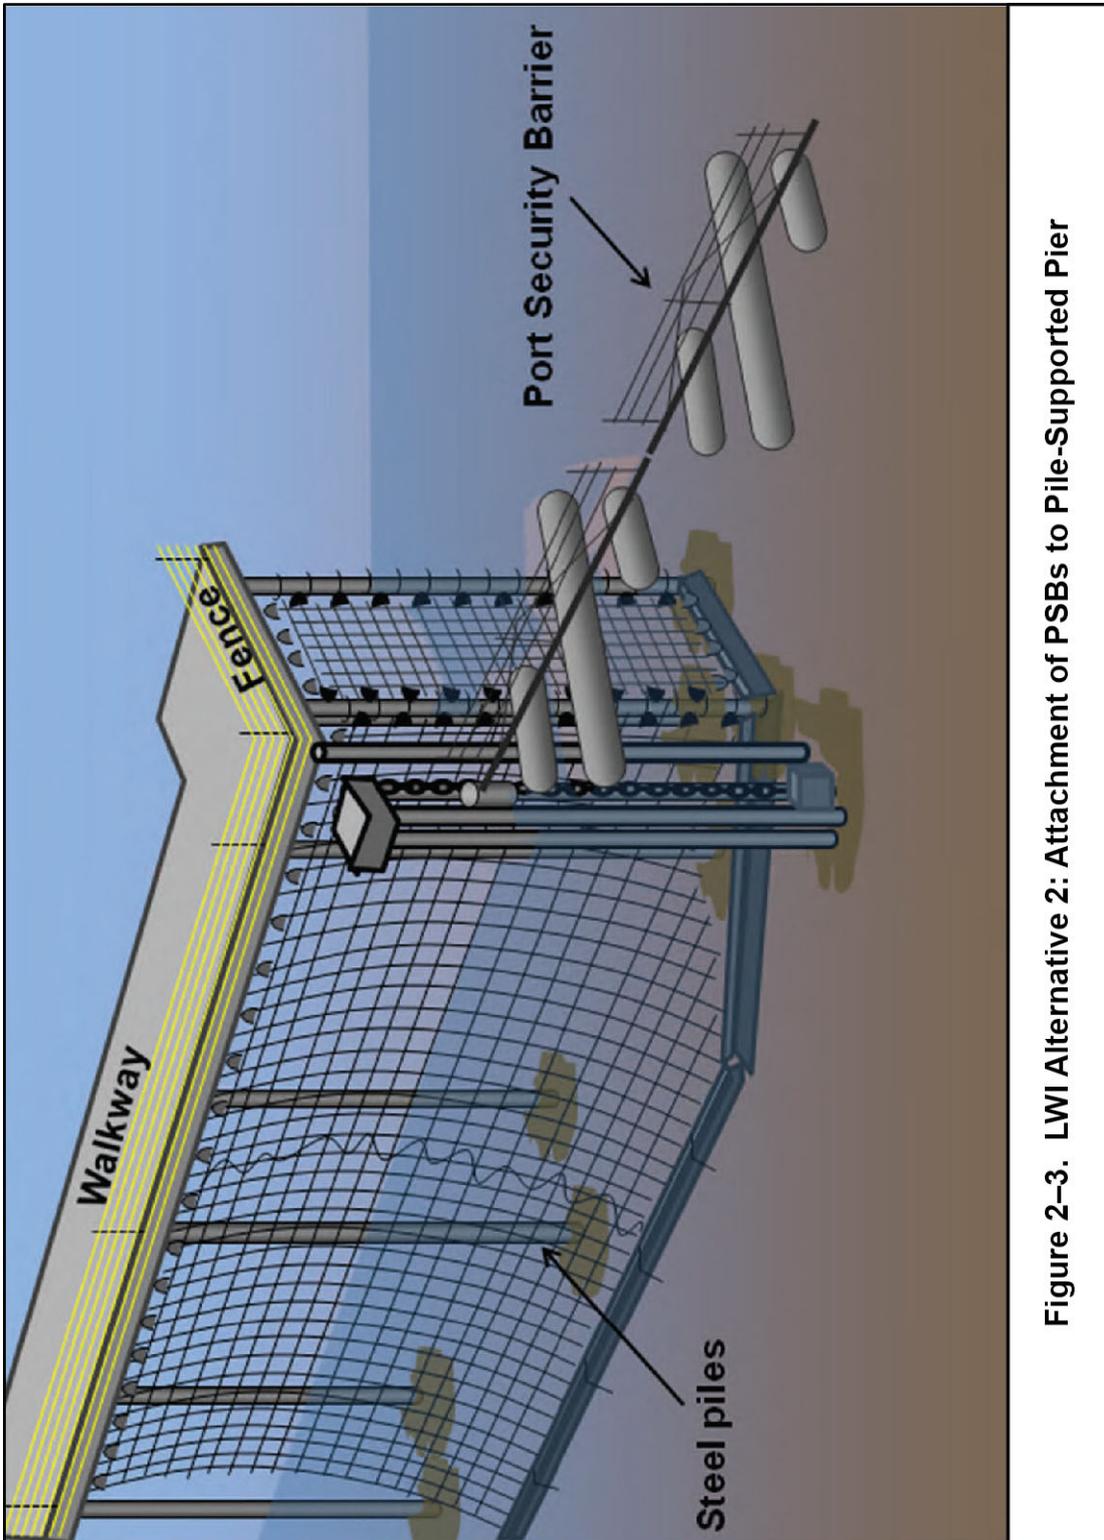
LWI Alternative 2: Attachment of PSBs to Pile-Supported Pier
